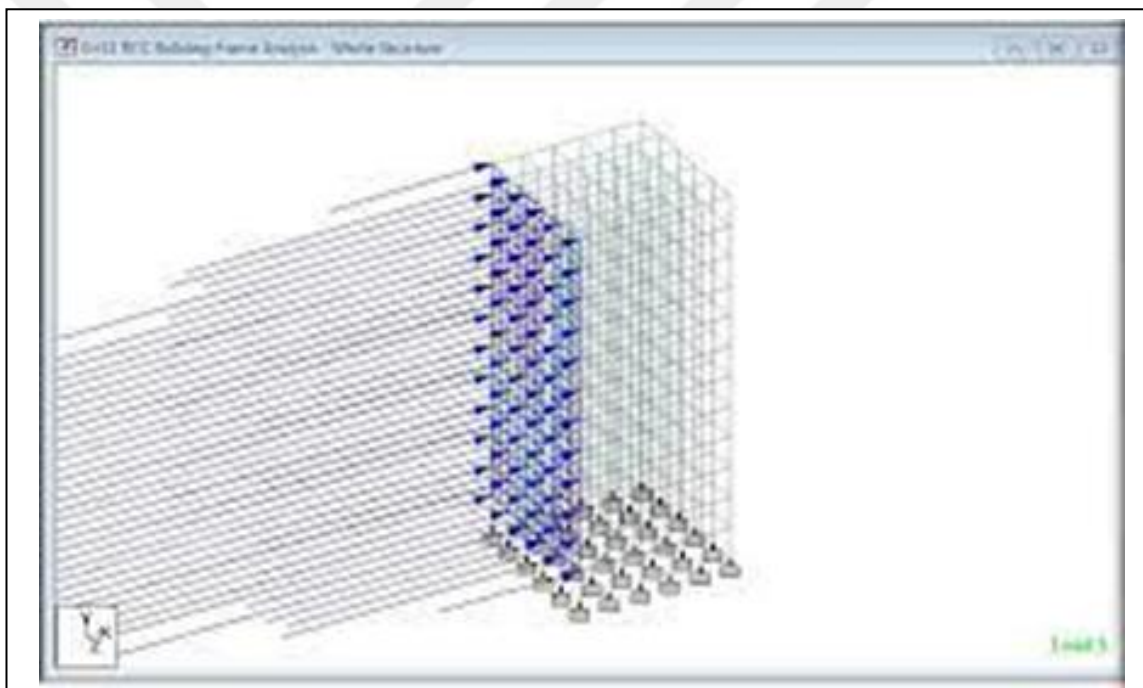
STAAD Pro was used to calculate, design and analyze an 11-storey building
